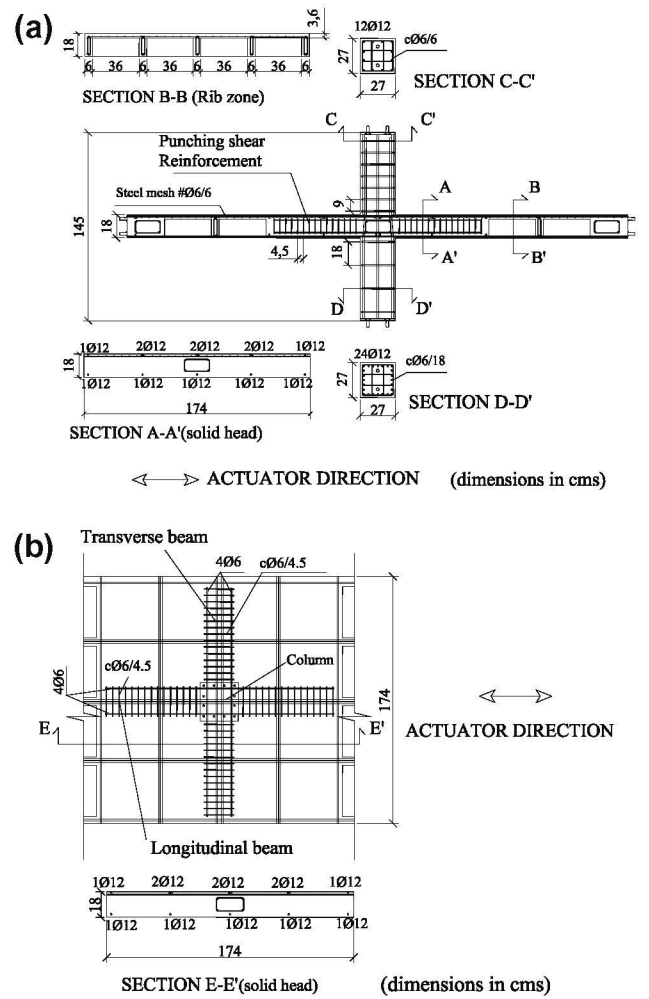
Geometry and reinforcement of the specimen: (a) elevation and (b) plan.
